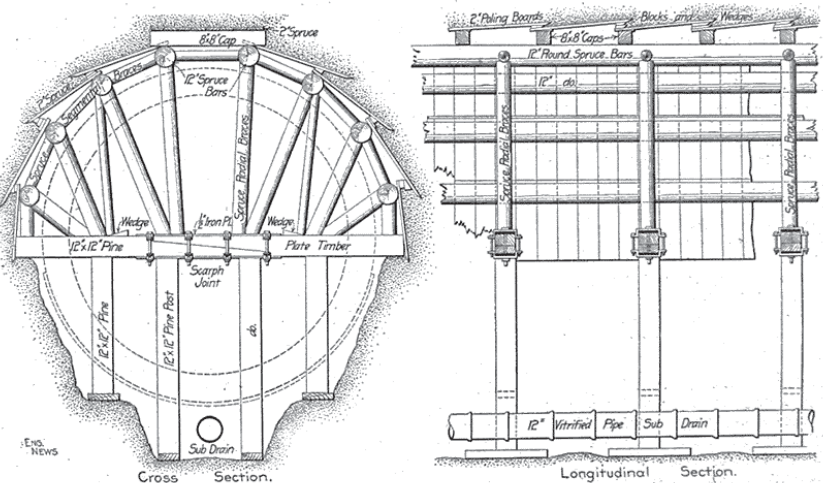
SECTION OF 60TH ST. SEWER TUNNEL, BROOKLYN, N. Y., SHOWING FULL SECTION TIMBERING.
